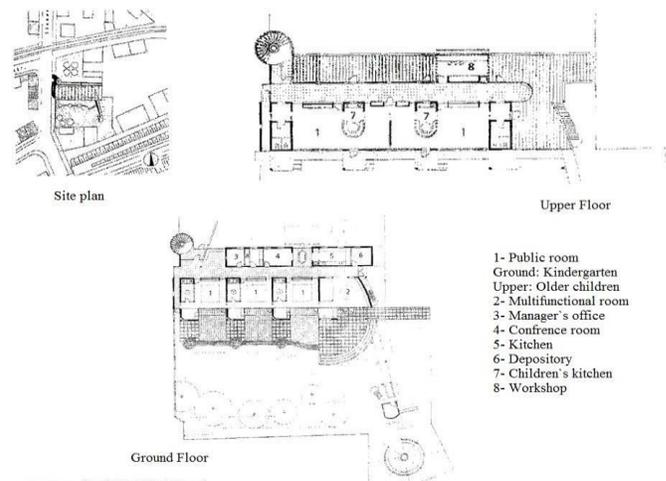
Plan of Frankfurt Sashnhausen kindergarten
